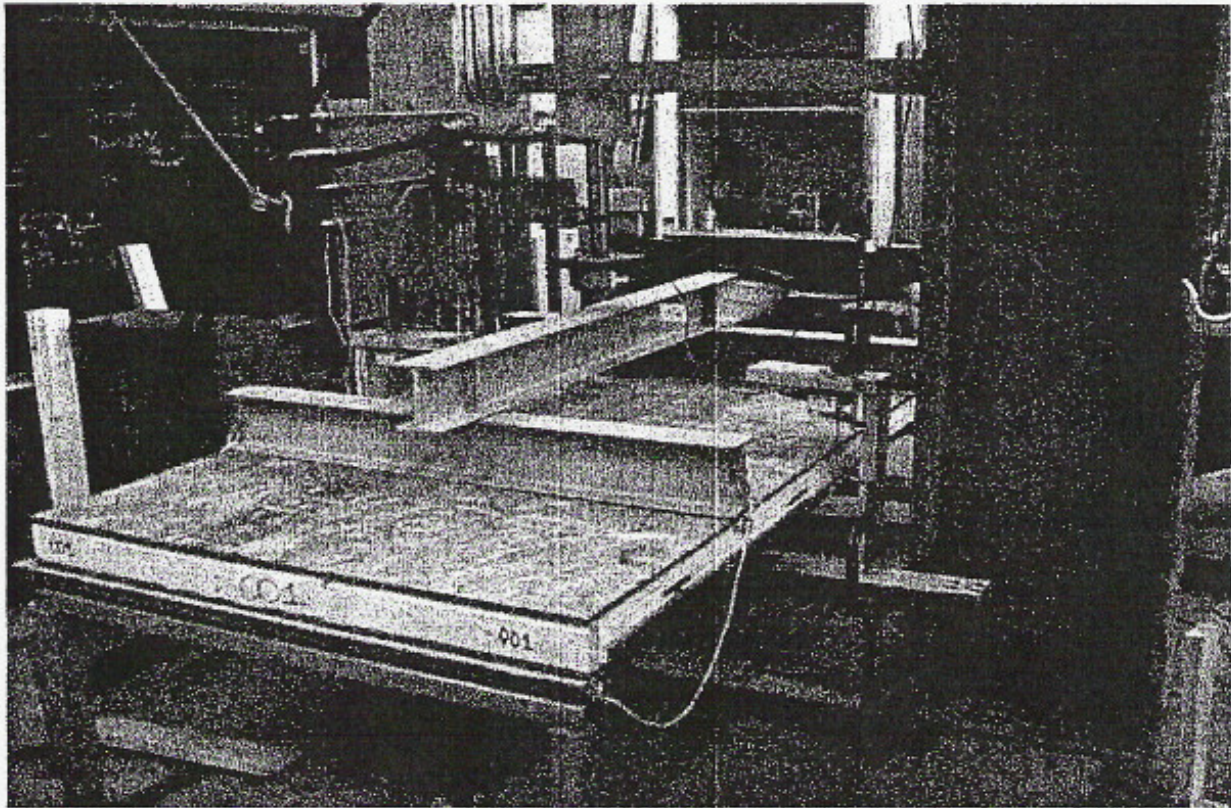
Test Setup for Transverse Loading on 8' OSB-OSB Panel
